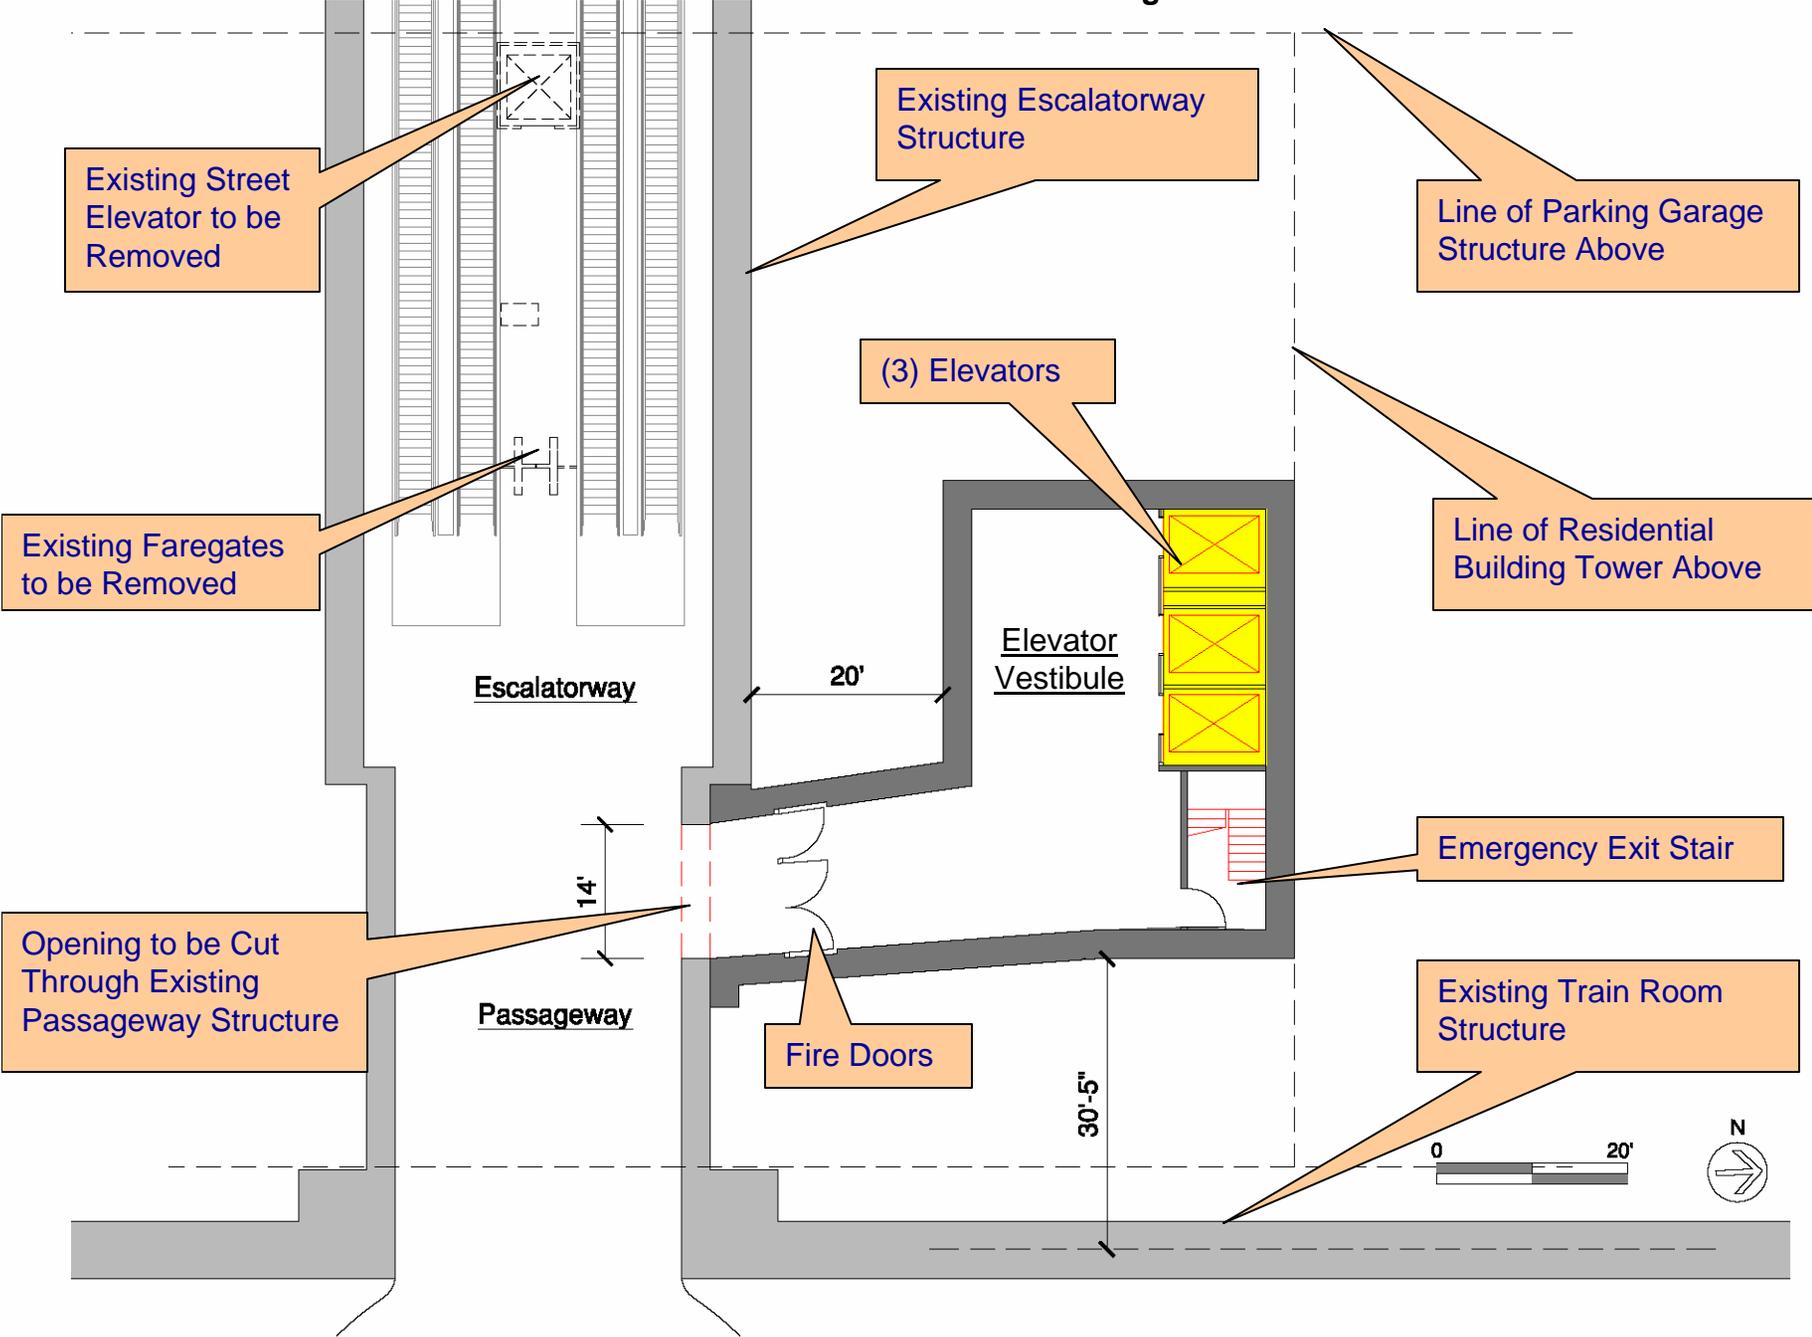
Alternative 2 – N. Lynn Street Level Plan
